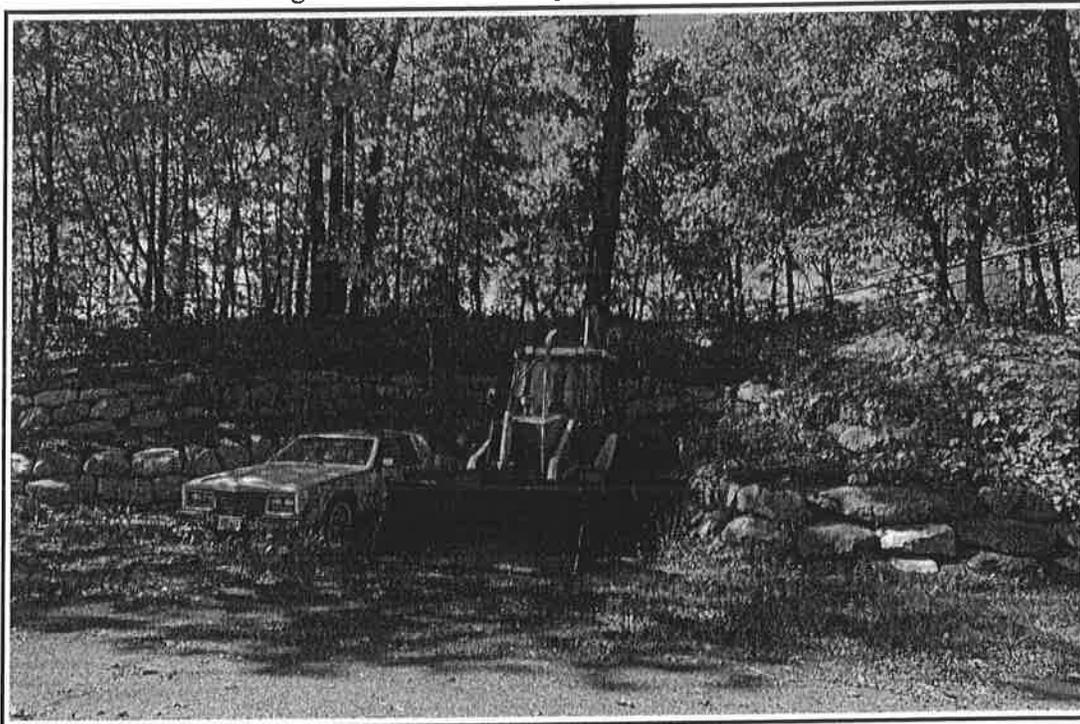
Looking west at subject (NOTE: improper encroachment for parking on subject)
